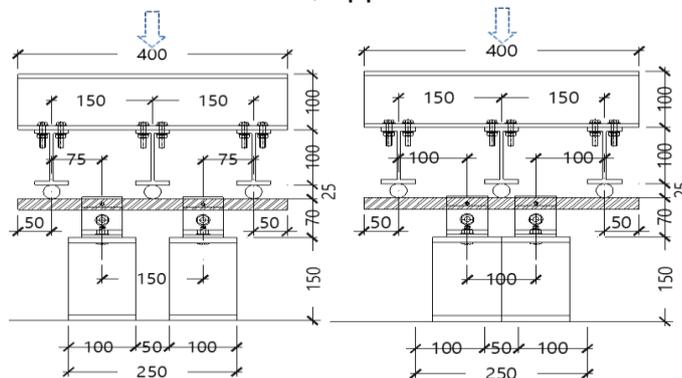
Direct Shear Test Model Dimension and Test Setup
